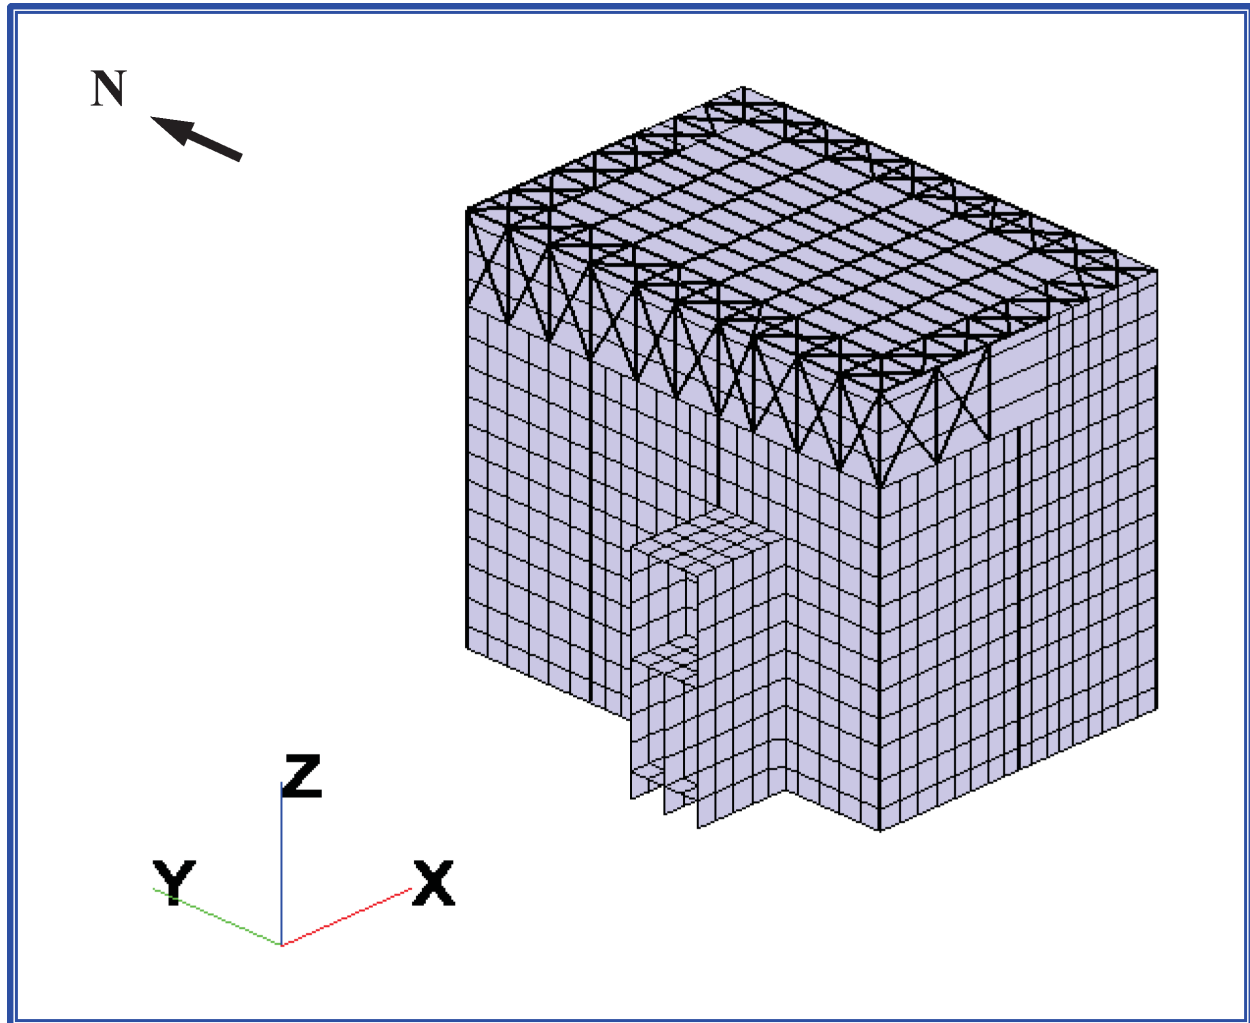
Control Building SASSI2010 Model Shell and Beam Element
